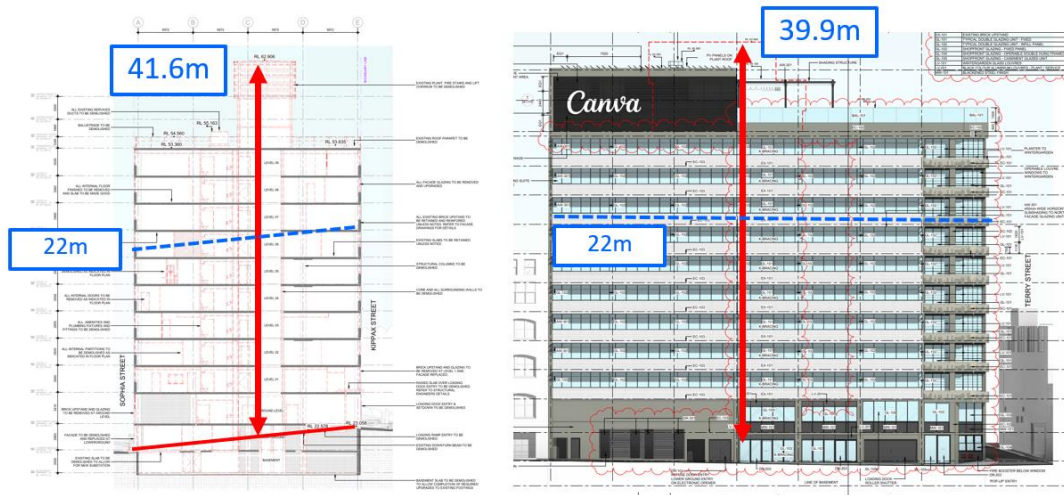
Existing height of building, measured between Kippax and Sophia Streets (left). The building has a proposed maximum building height of 39.9m, measured from existing ground levels at the Sophia Street frontage (right).
